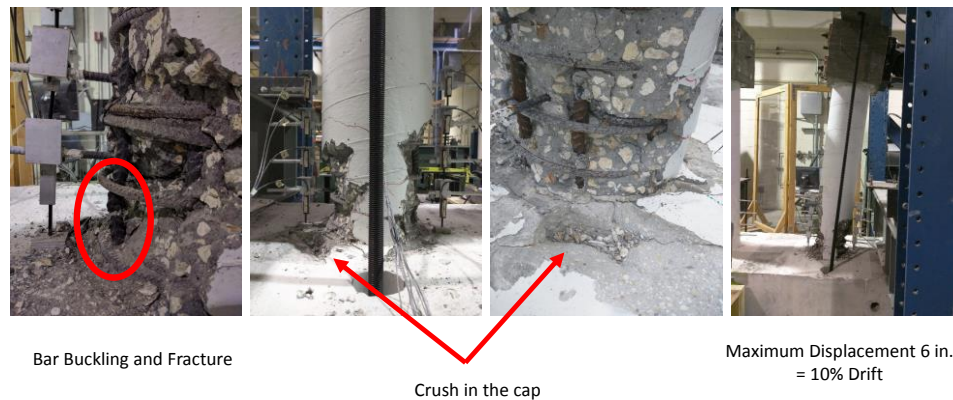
Failure pattern, longitudinal rebar fracture and location of the plastic hinge in the S-5-R.
